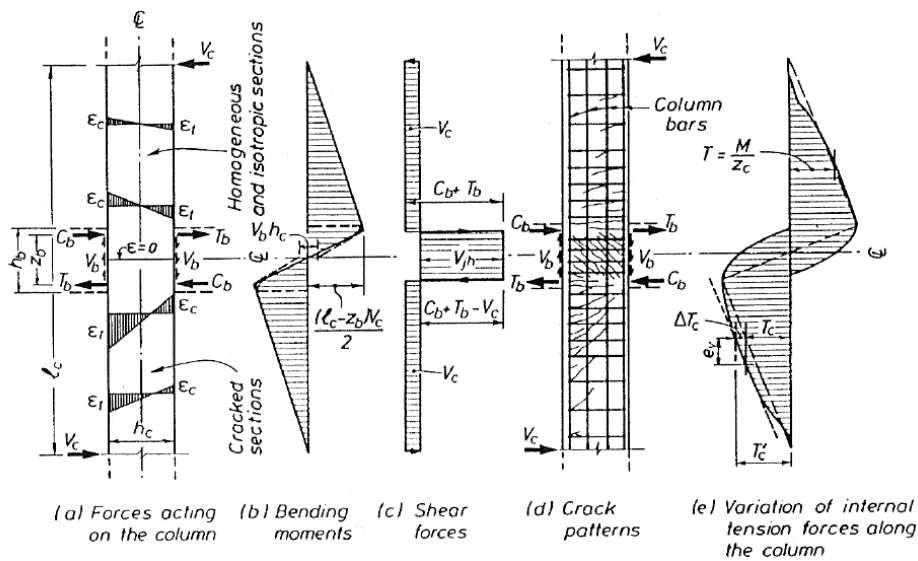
Features of column and joint behaviour (Paulay & Priestley, 1992).
